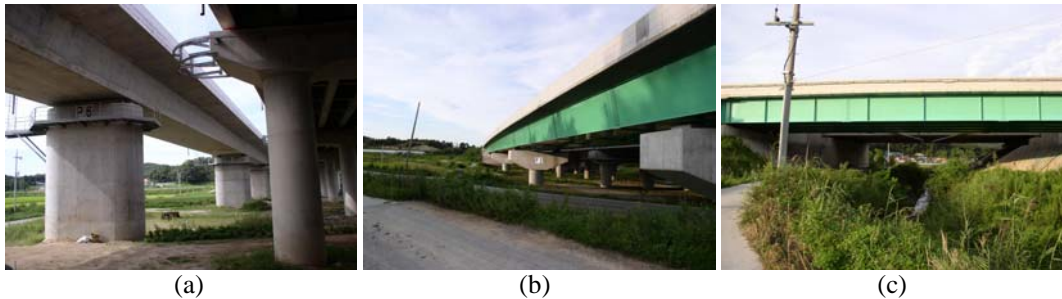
Three test-road bridges: (a) Geumdang Bridge; (b) Yondai Bridge; (c) Samseung Bridge.
